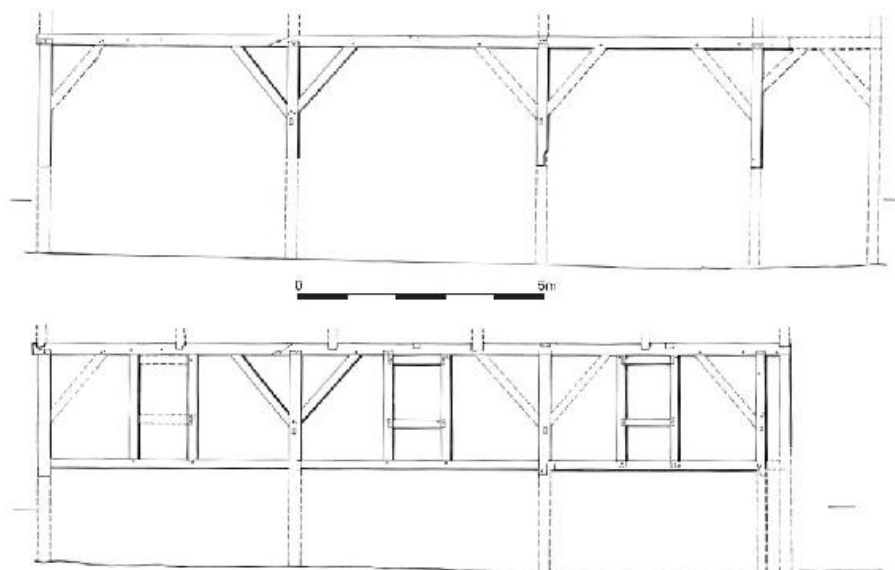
Outline survey of the existing timber-framing of the south elevation of the Cathedral Barn (bottom) with, above, a partial reconstruction of the arcade frame of the aisled building from which it was reconstructed
